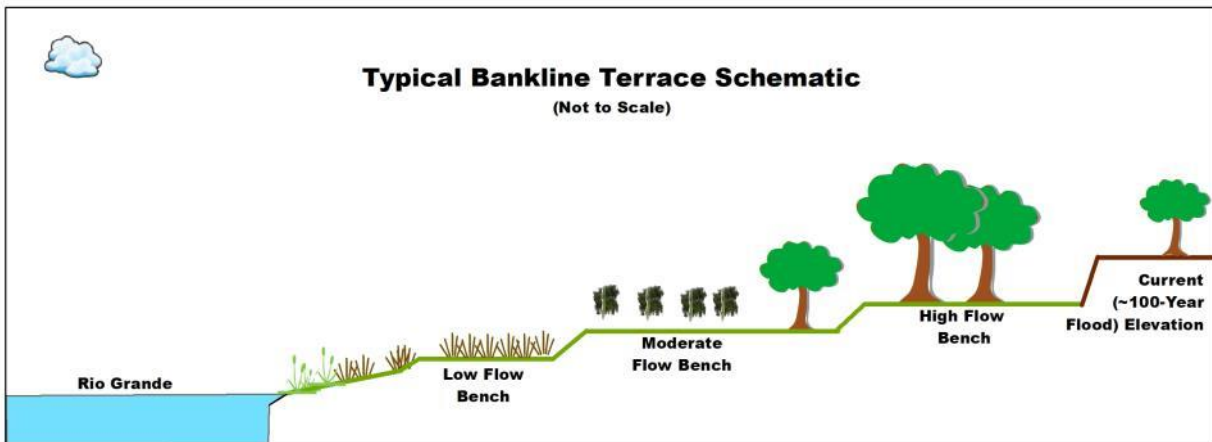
Schematic cross-section of terraced bankline concept
